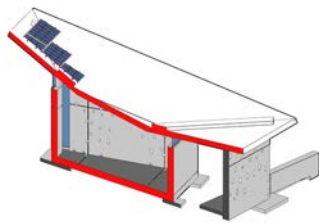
Passive Optimization – Thermal mass: the thermal envelope is comprised entirely of thick layers of precast concrete sandwiched around layers of expanded polystyrene insulation.
